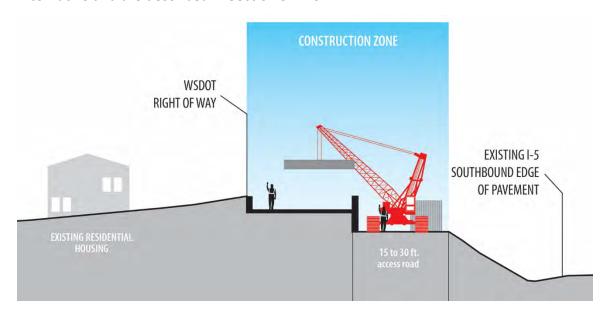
I-5 Construction (Typical Cross-Section)
